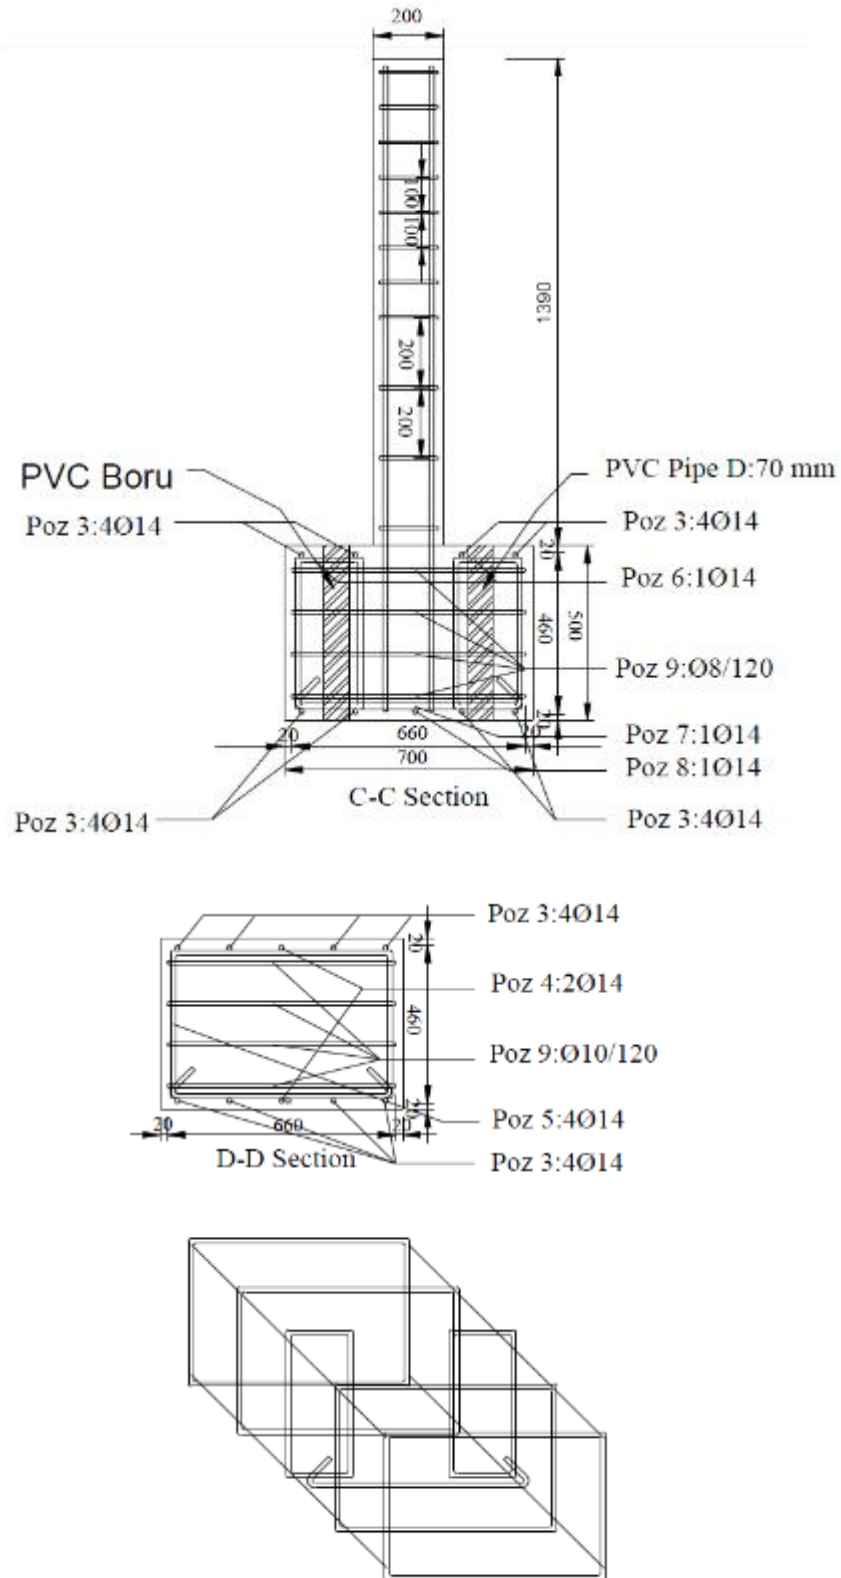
Reinforcing cage of the first type specimens(south side).
